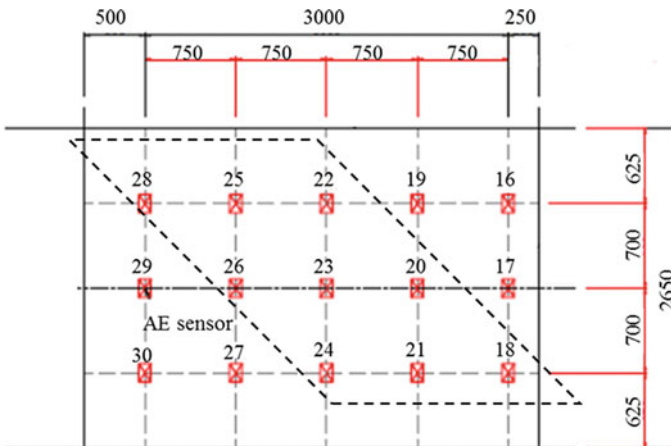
Sensor arrangements for AE measurement on in-situ RC bridge decks
